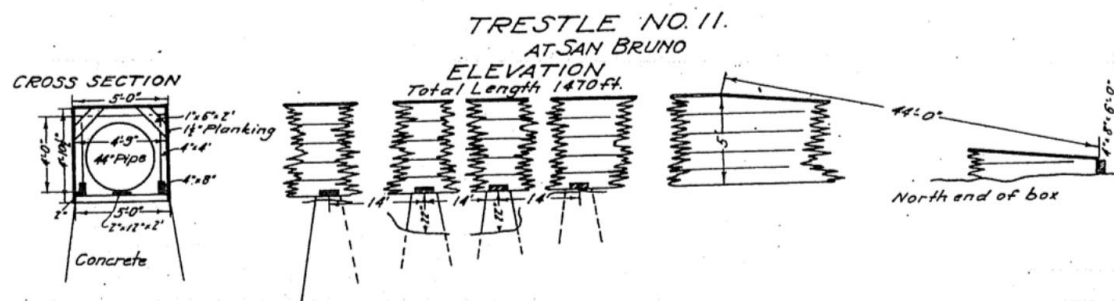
Crystal Springs Trestle 11 (1,470 feet long)
